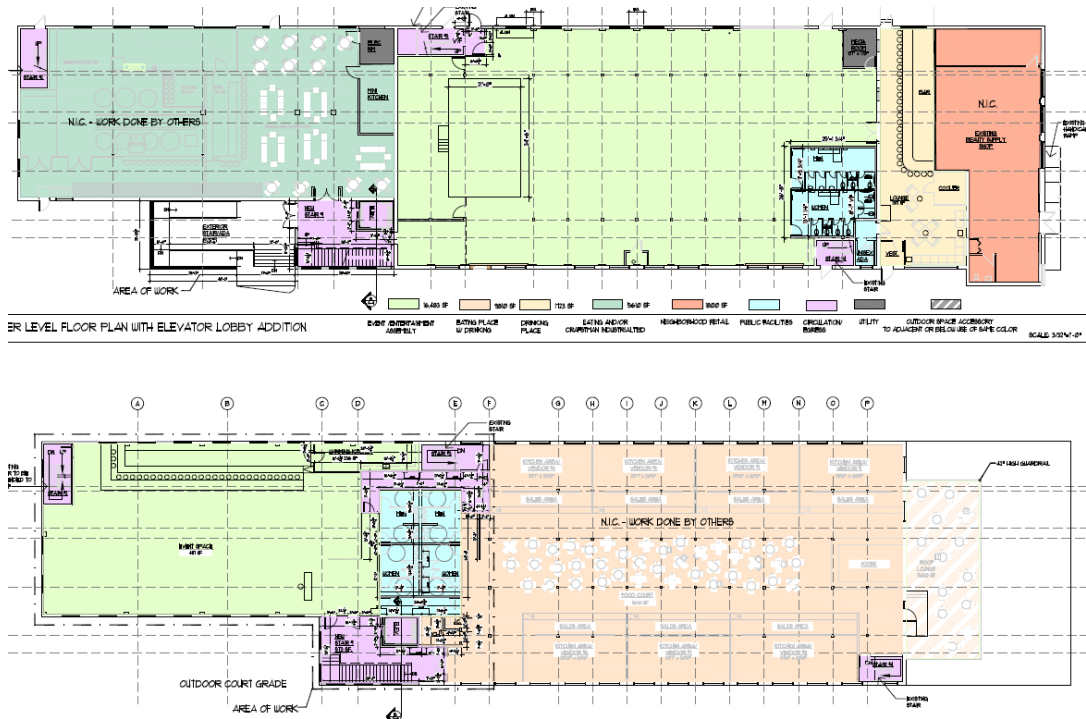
Proposed and existing uses layout – Lifecare Design 2022
